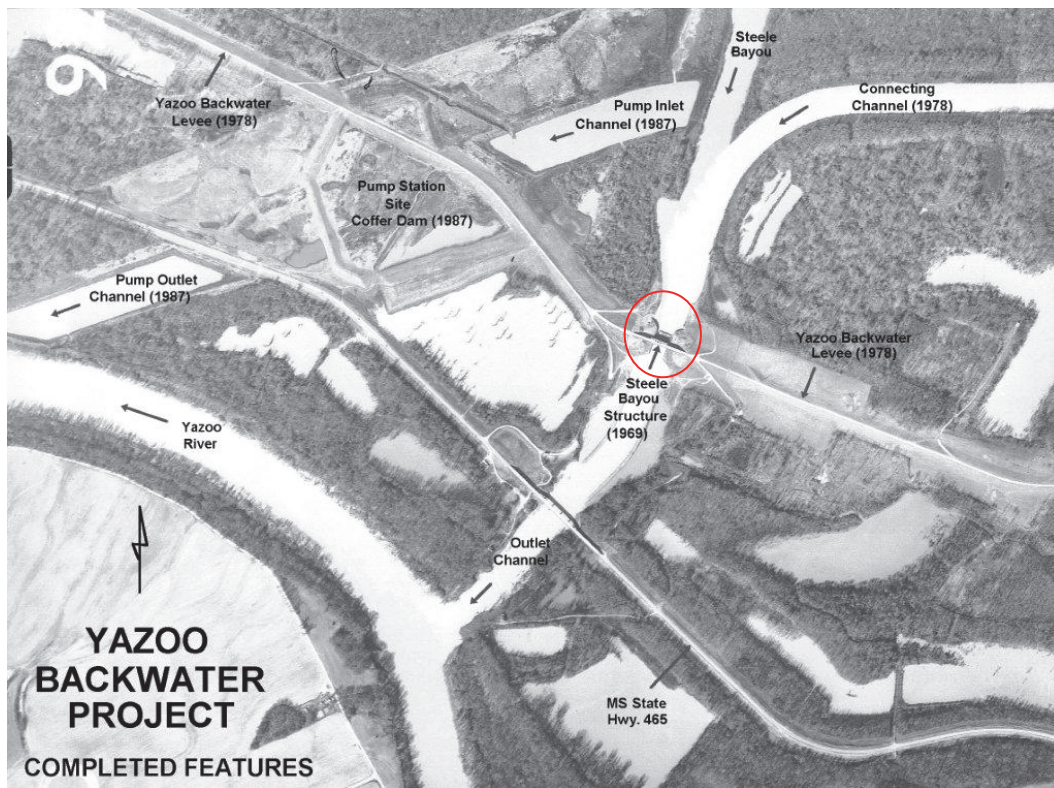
Aerial view of the Steel Bayou Drainage Structure. (Furnished by U.S. Army Engineer District, Vicksburg).
